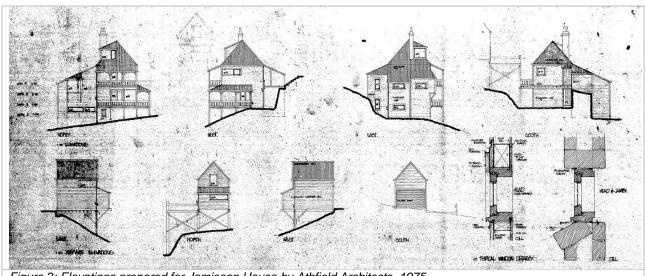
Elevations prepared for Jamieson House by Athfield Architects, 1975.
